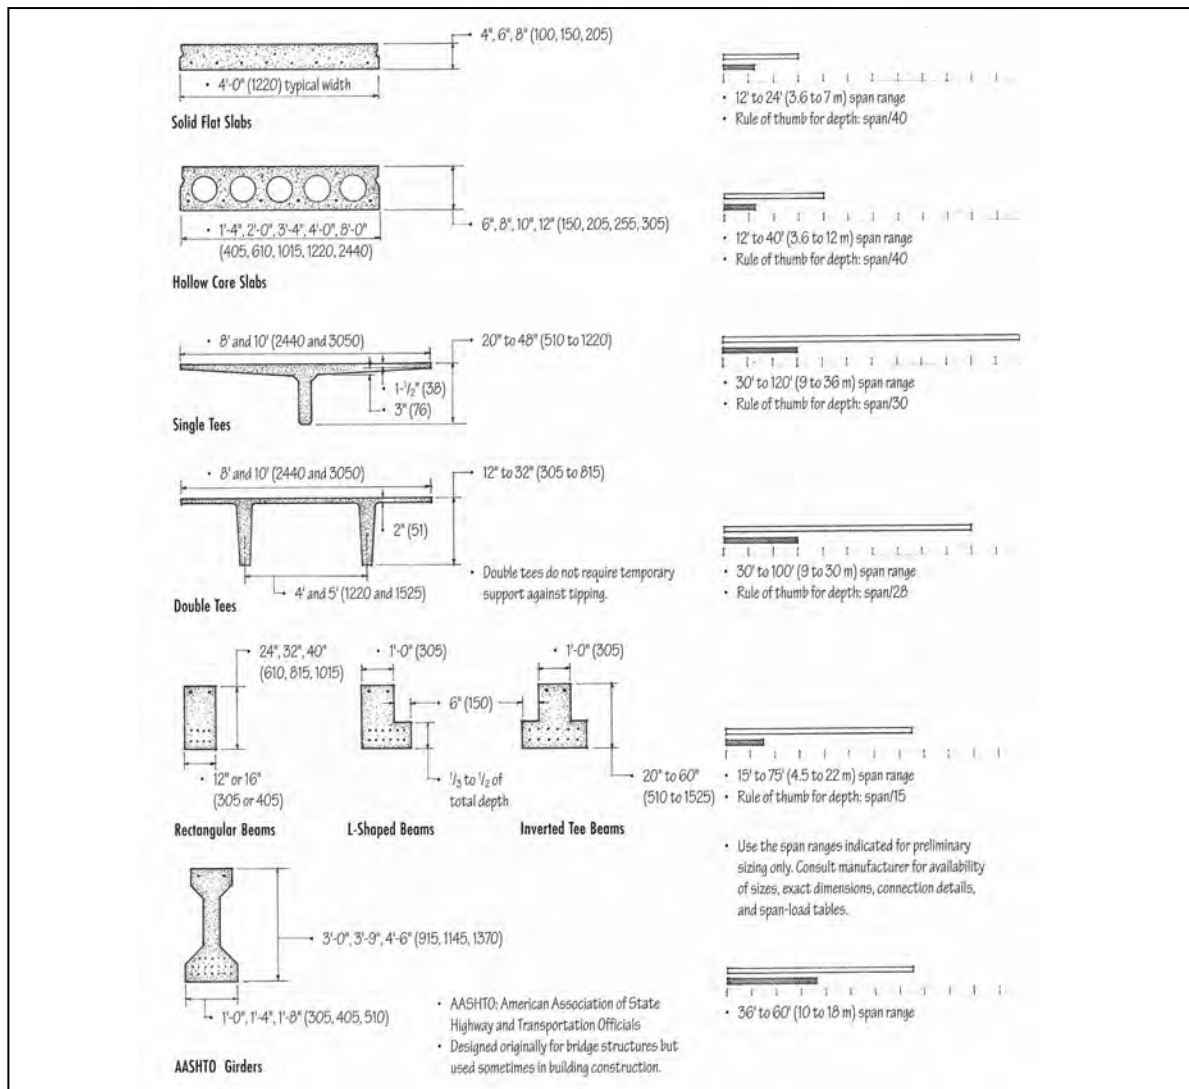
Types of Precast Concrete Units. *Building Construction Illustrated*, Ching/Adams. p4.12
